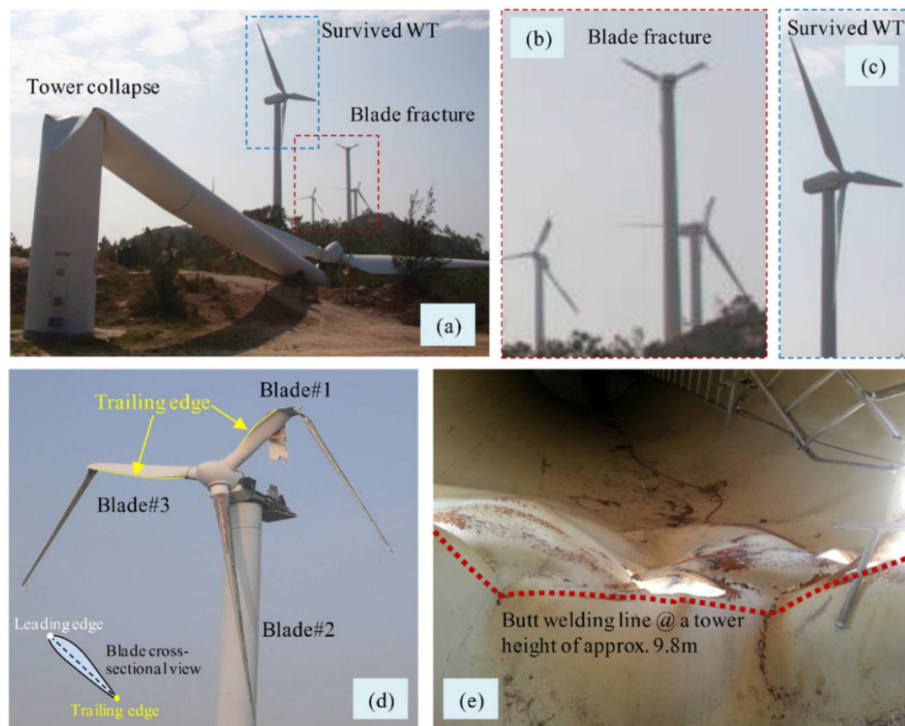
Different fracture patterns of wind turbines damaged by the super typhoon Usagi in 2013. (a) Tower collapse at the bottom. (b) Fractured blades. (c) Intact wind turbine. (d) Two fractured blades in one turbine. (e) The details at the collapsed tower location. This figure is from Ref. (Chen & Xu, 2016).
